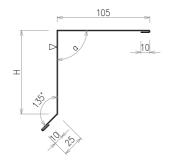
Ob-32 flashing "IzoRoof panel wind beam, type V - no overhang"
